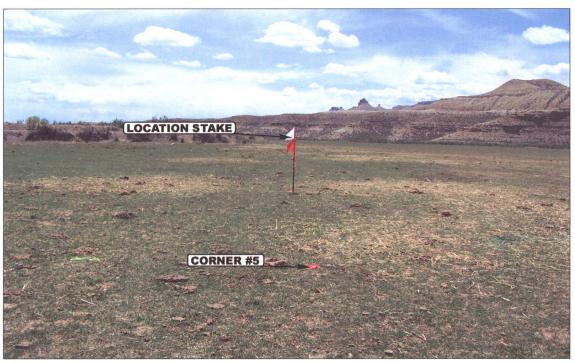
PHOTO: VIEW FROM CORNER #5 TO LOCATION STAKE
